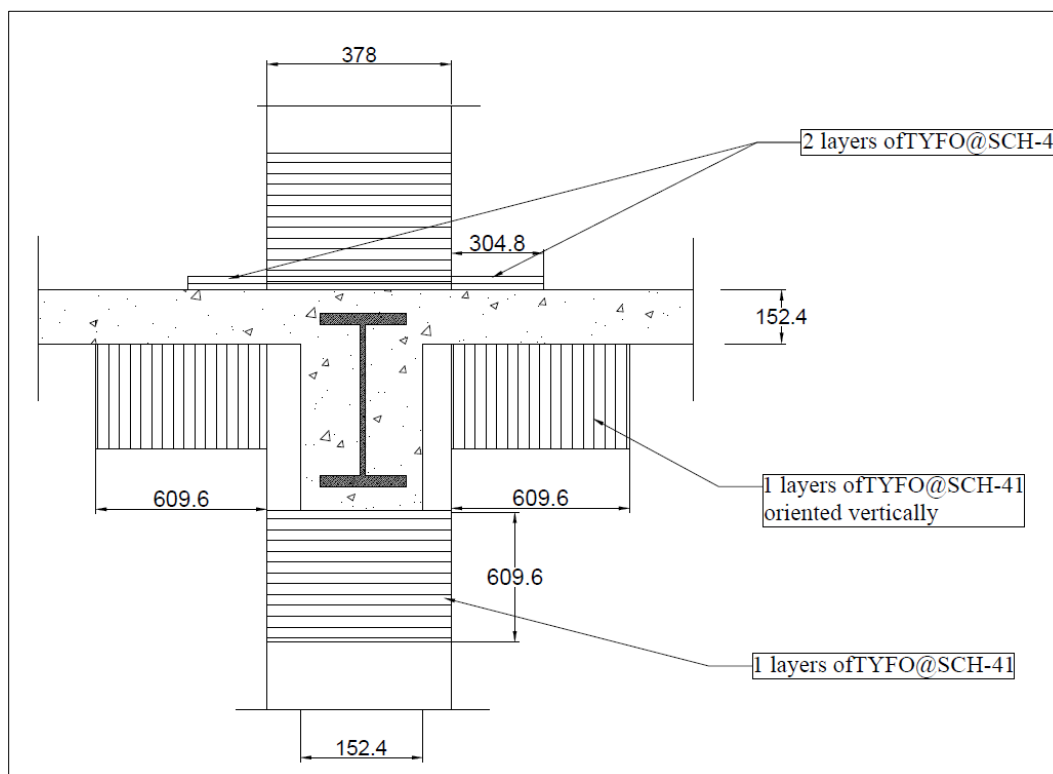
Cross-section details of retrofitted connection (T1 specimen)
